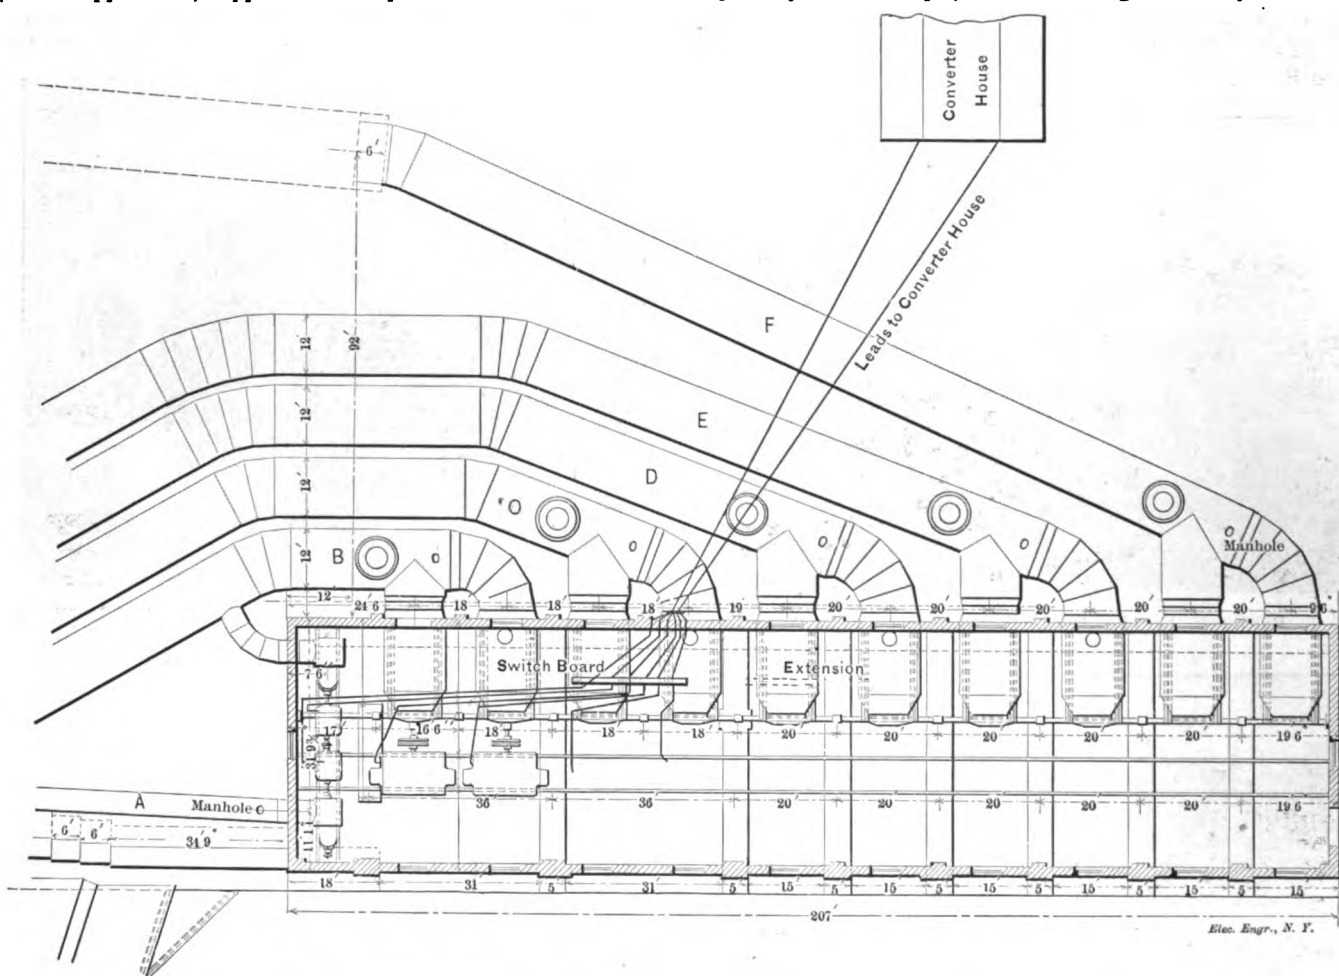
HELENA W. & E. POWER CO., PLAN OF RENSTOCKS, TUNNEL AND POWER HOUSE.
